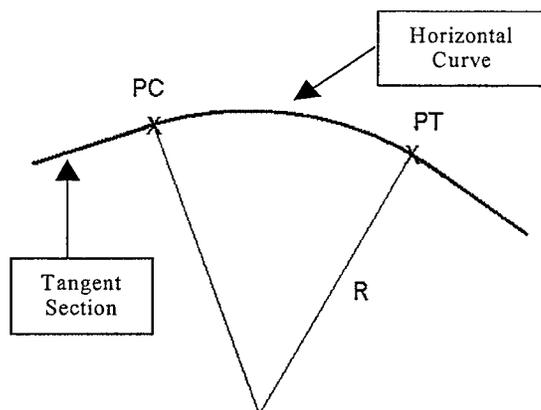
A Plan – An Example of Horizontal Alignment Plot
